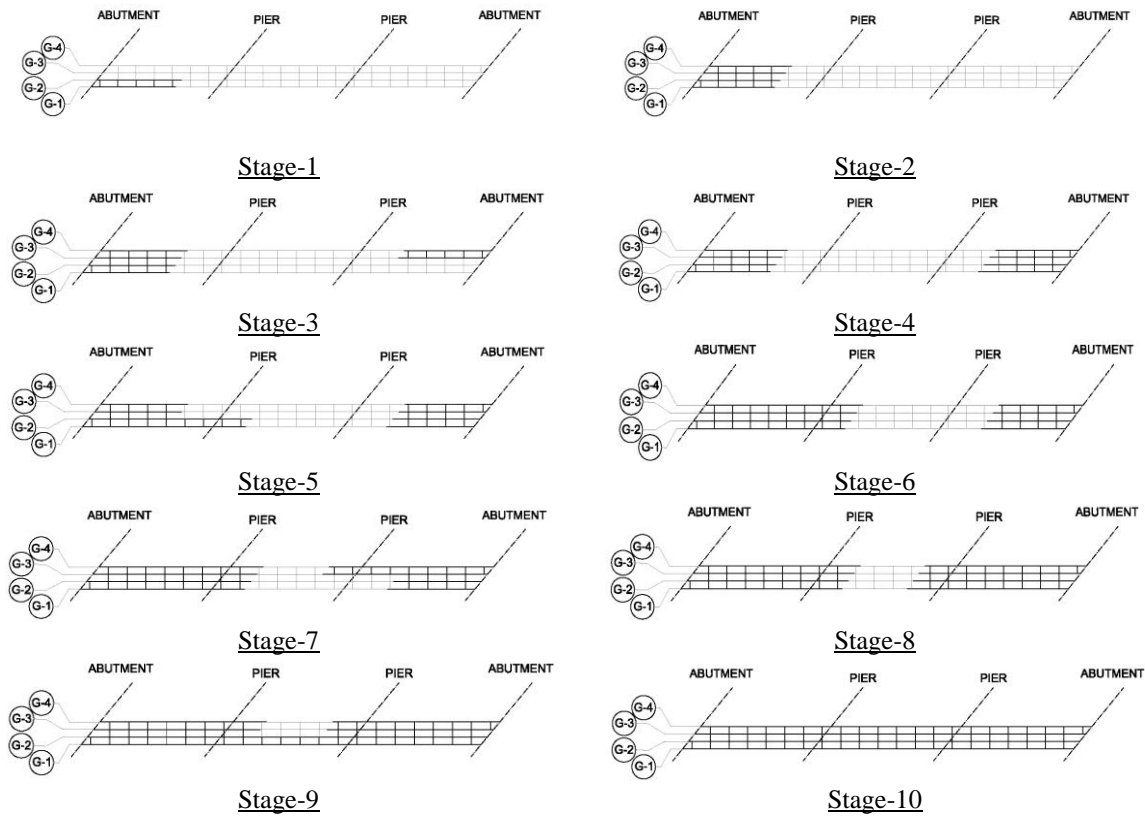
Stage 1 to Stage 10 of Construction for “Drop-In” Erection of Bridge S-9 and Bridge S-10.
